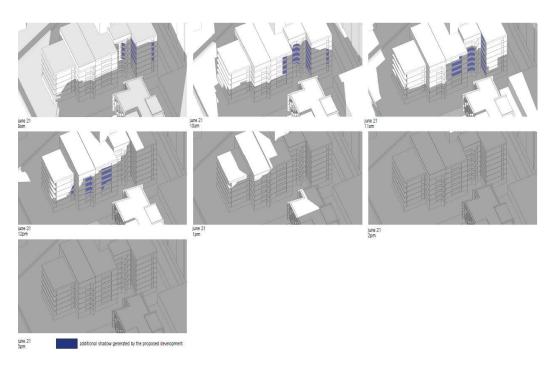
Axonometric drawing extract of midwinter overshadowing to the 'Casa Del Sol' building at 19-21 Billyard Avenue, Elizabeth Bay
